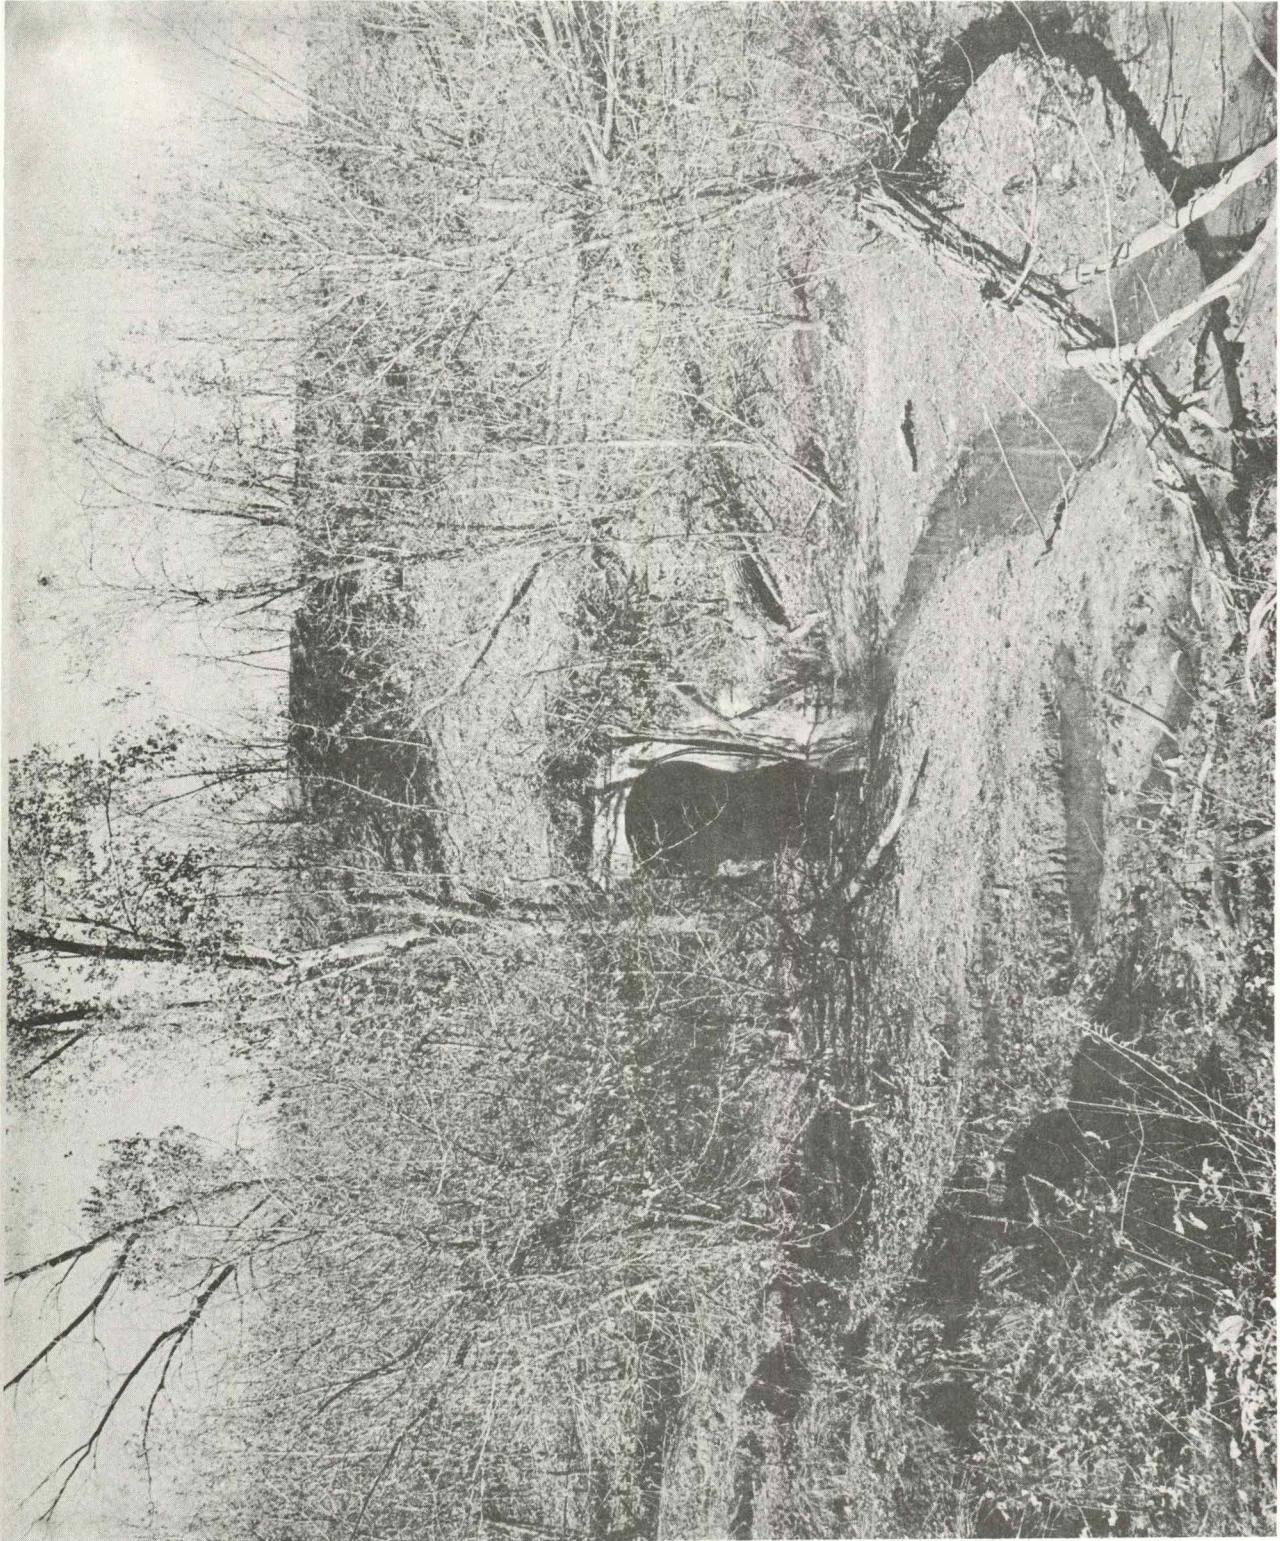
Abandoned railroad embankment and culvert at proposed location of Railroad Lake dam.
